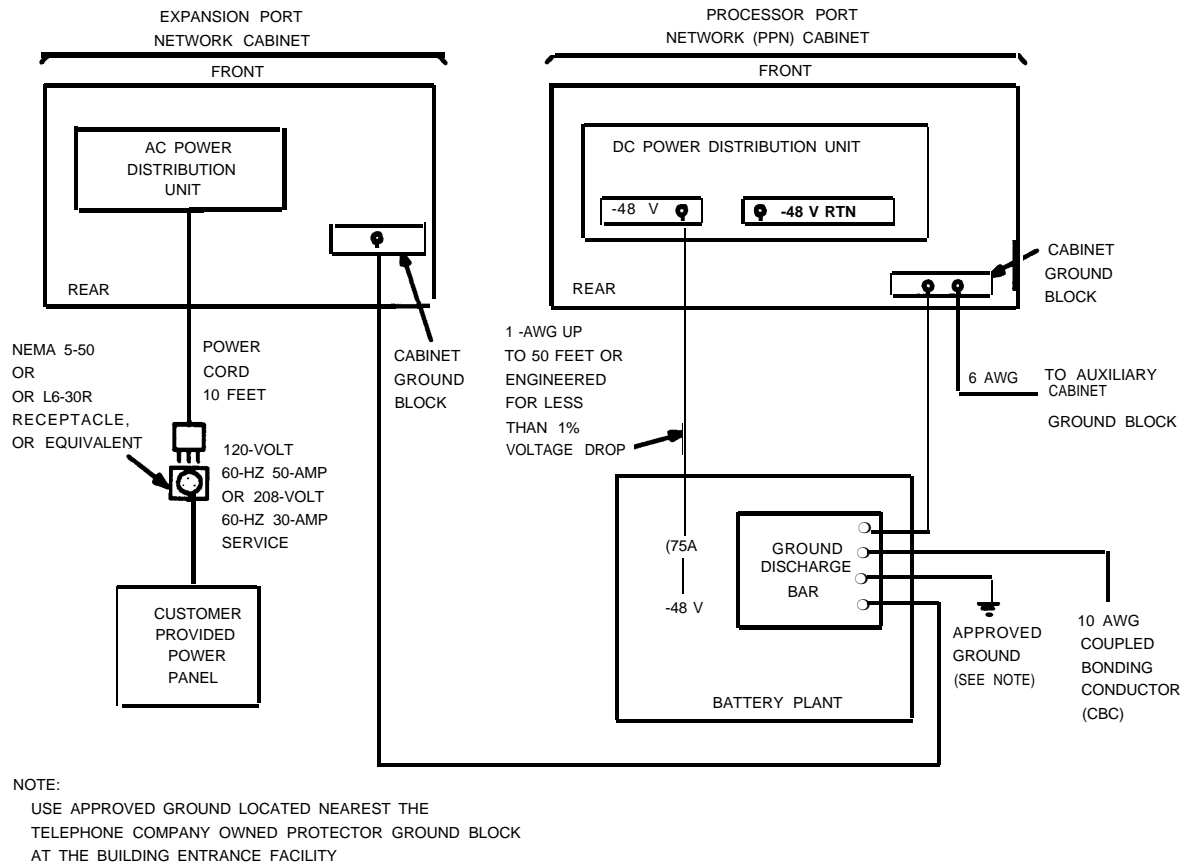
Typical Multicarrier Mixed AC/DC Power and Grounding Layout (EPN Colocated)
